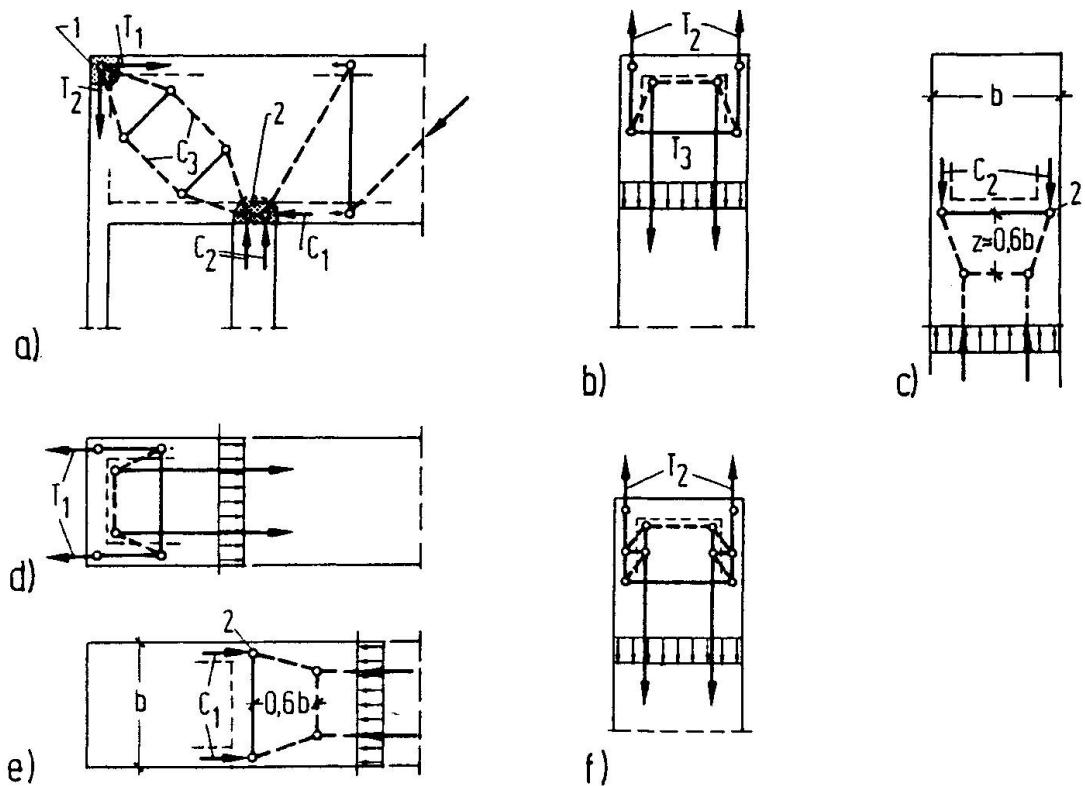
Strut-and-tie models for the structure without internal diaphragm wall. a) Web; b) tensile wall; c) compression wall; d) top flange; e) bottom flange. f) Refined model for the lap problem characterized in Figs. b and d
